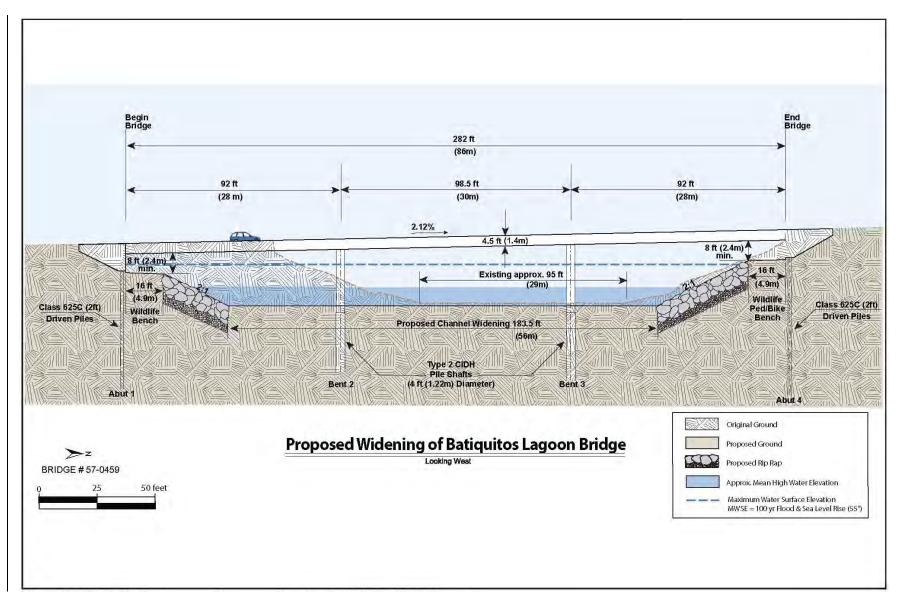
Batiquitos Lagoon: Cross-sections for the Existing I-5 Bridge and Proposed 8+4 Buffer
